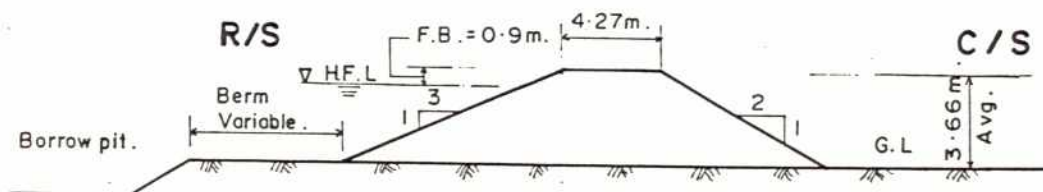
TYPICAL EMBANKMENT SECTION OF
